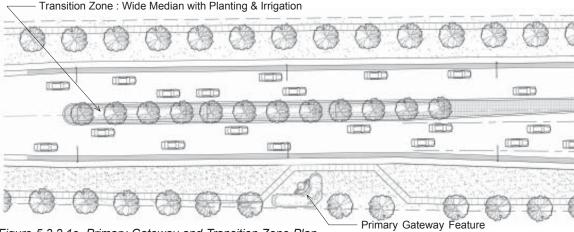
Primary Gateway and Transition Zone Plan
